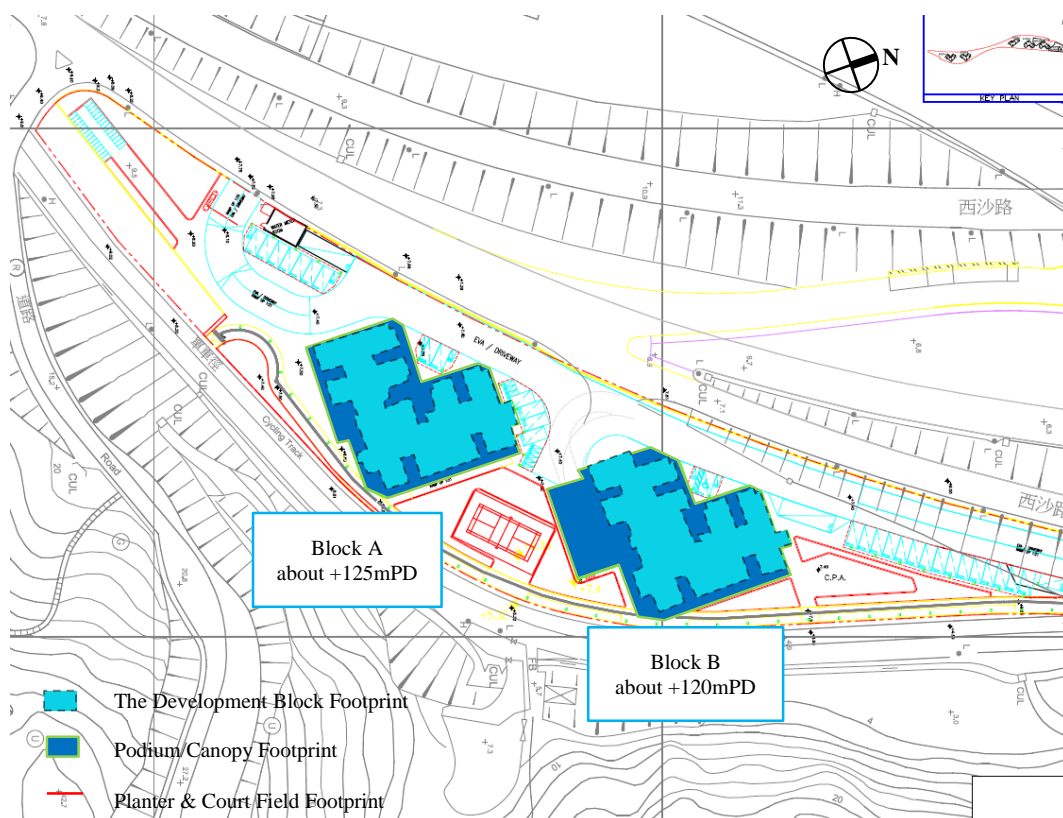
Proposed Scheme Master Layout Plan (Block A & B)
